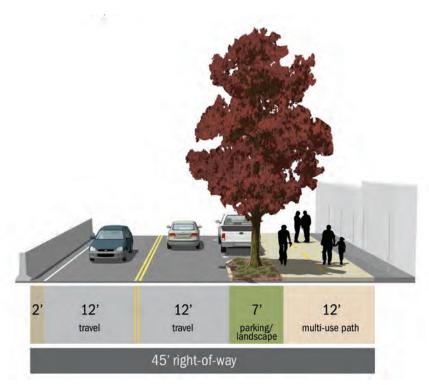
Conceptual Cross-Section for Main Street – Milport Road to Beta Street within existing right-of-way (looking north)
